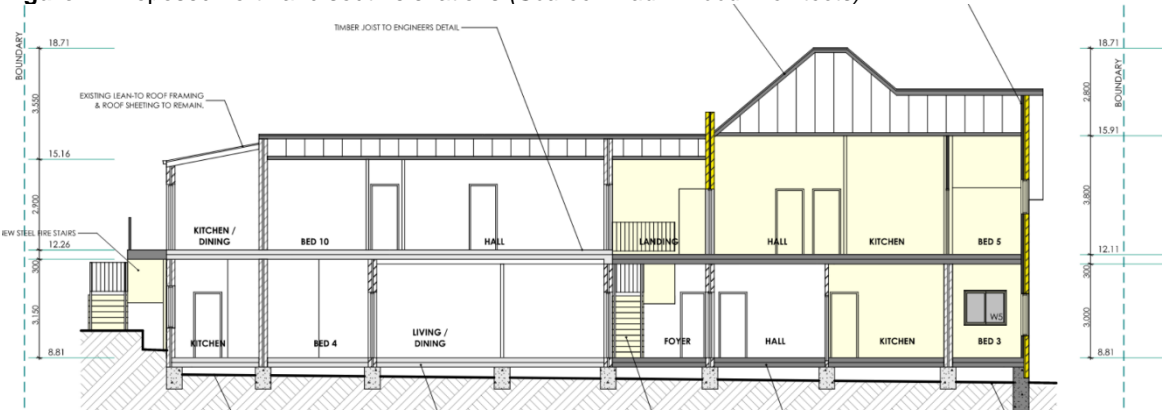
Proposed section plan (Source: Brad Inwood Architects)
